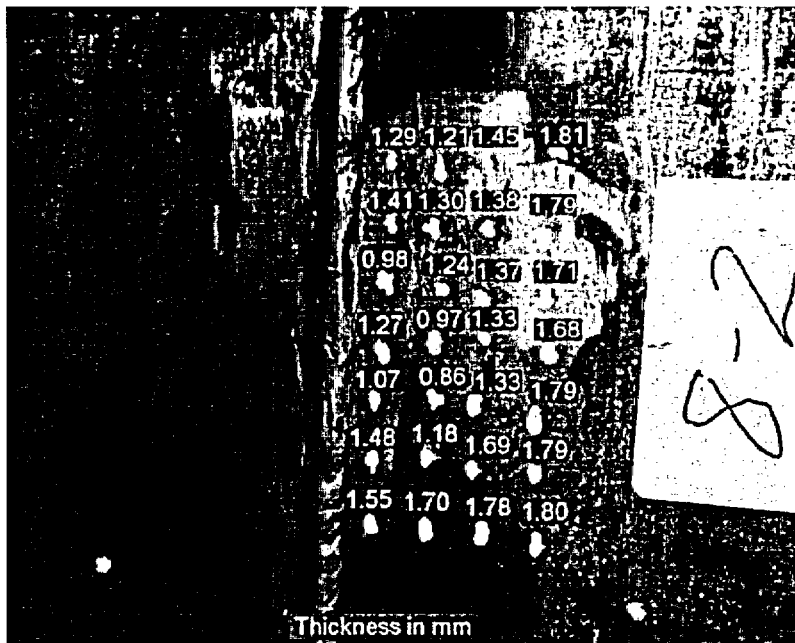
Liner thicknesses (in millimeters) measured ultrasonically in the vicinity of tear #8-2. Note the extensive grinding extending distant from main weld.
